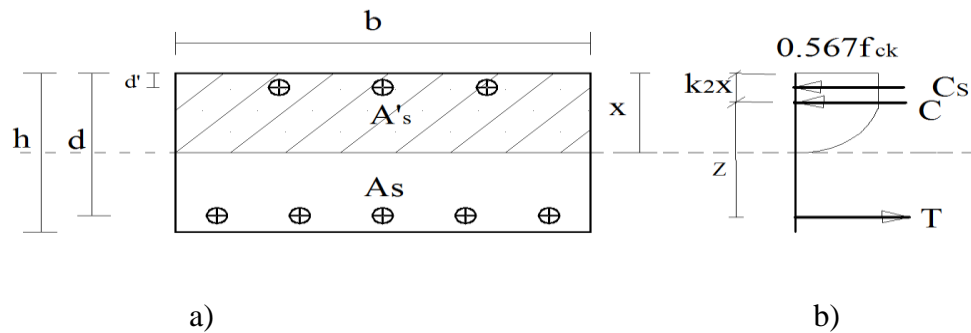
Doubly reinforced section of shell, a) section, b) forces.
